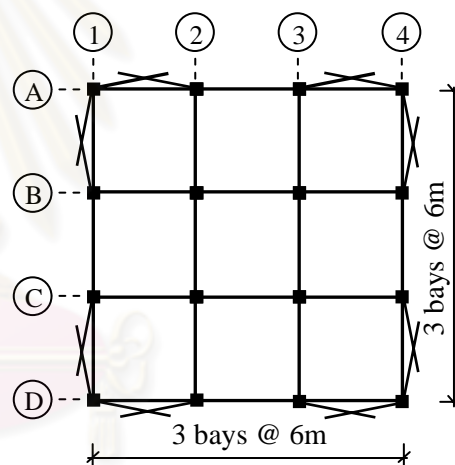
Floor plans of 10- and 14-story BRBF buildings.
